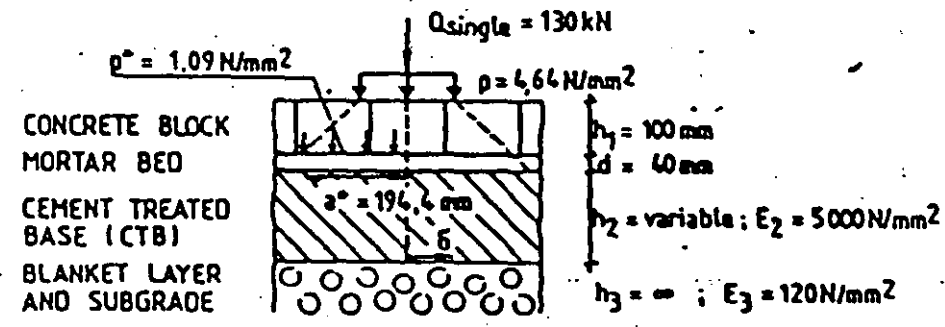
Concrete block pavement for container terminals: bending tensile stresses at bottom of the cement treated base under container loading
